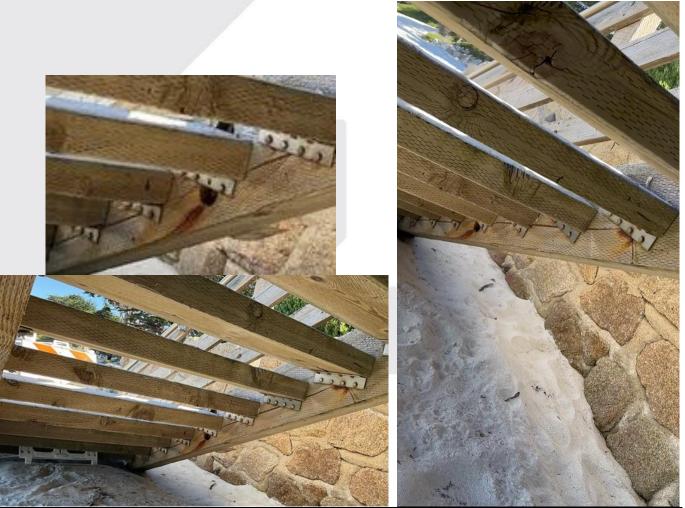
Stair 7 Split Stringer at Countersunk Post Connections Replace (2) 6x12 Stringers
